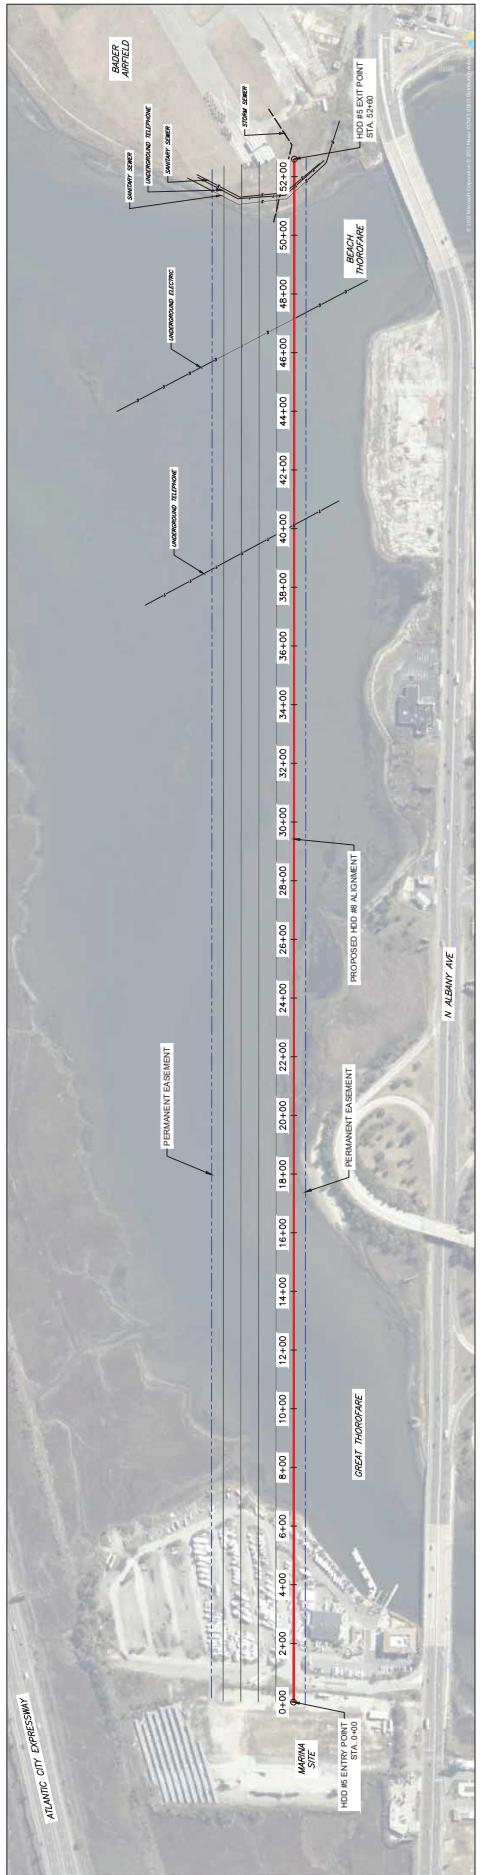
Great Thornton Crossing #1 HDD Plan and Profile
